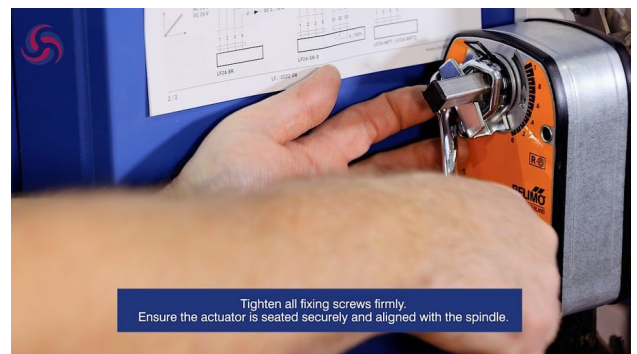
Tightening the actuator fixing screws. Confirm the actuator is seated securely and aligned with the spindle.
